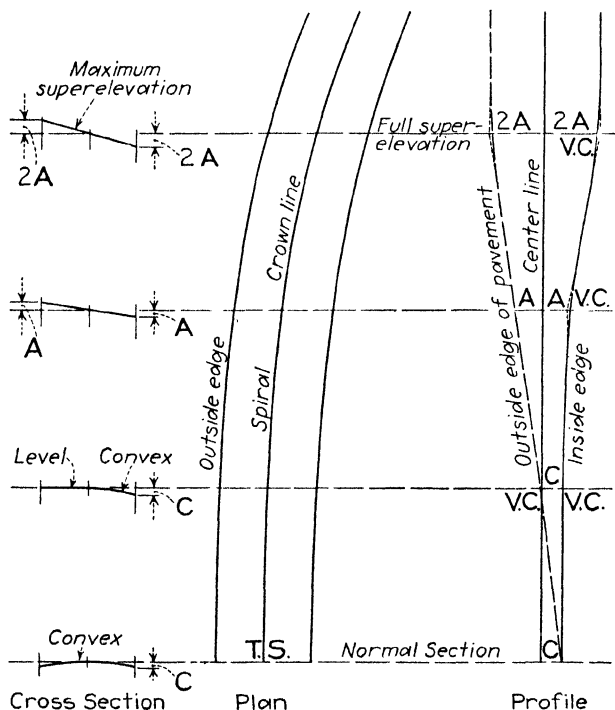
Plan showing development of transition from convex to plane section sloping inward; where C equals crown, and 2A equals maximum superelevation.
